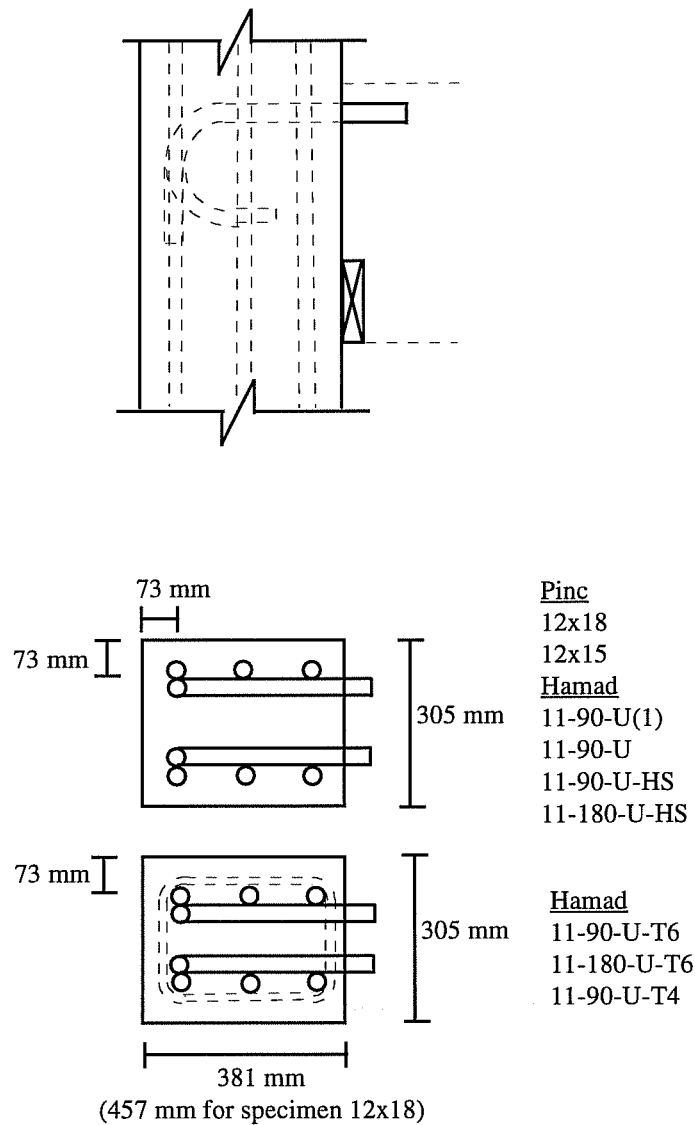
Joint details of the #11 Hooked bar Specimens by Pinc [11] and Hamad [12]
